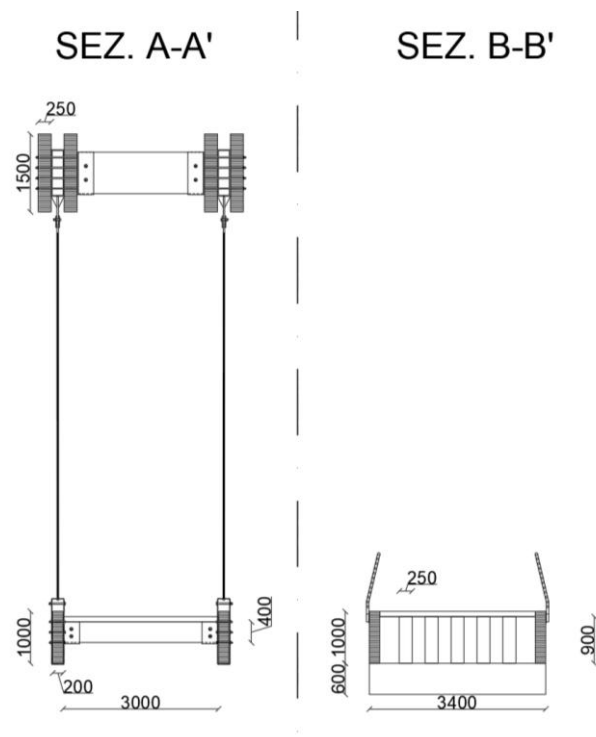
(a) Section A-A' with "Hangers - Deck - Double Arch" Connection; (b) Section B-B' with Deck-Lateral Barrier.
